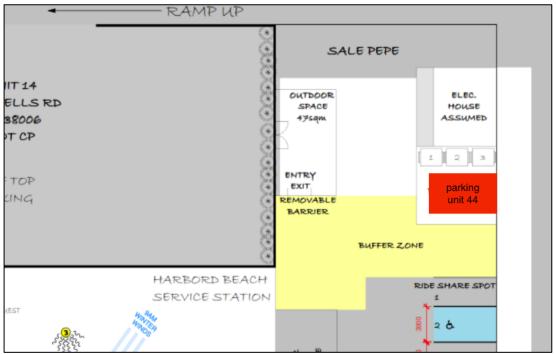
Parking plan showing 1 x car space dedicate to tenancy (source: Sale Pepe)
